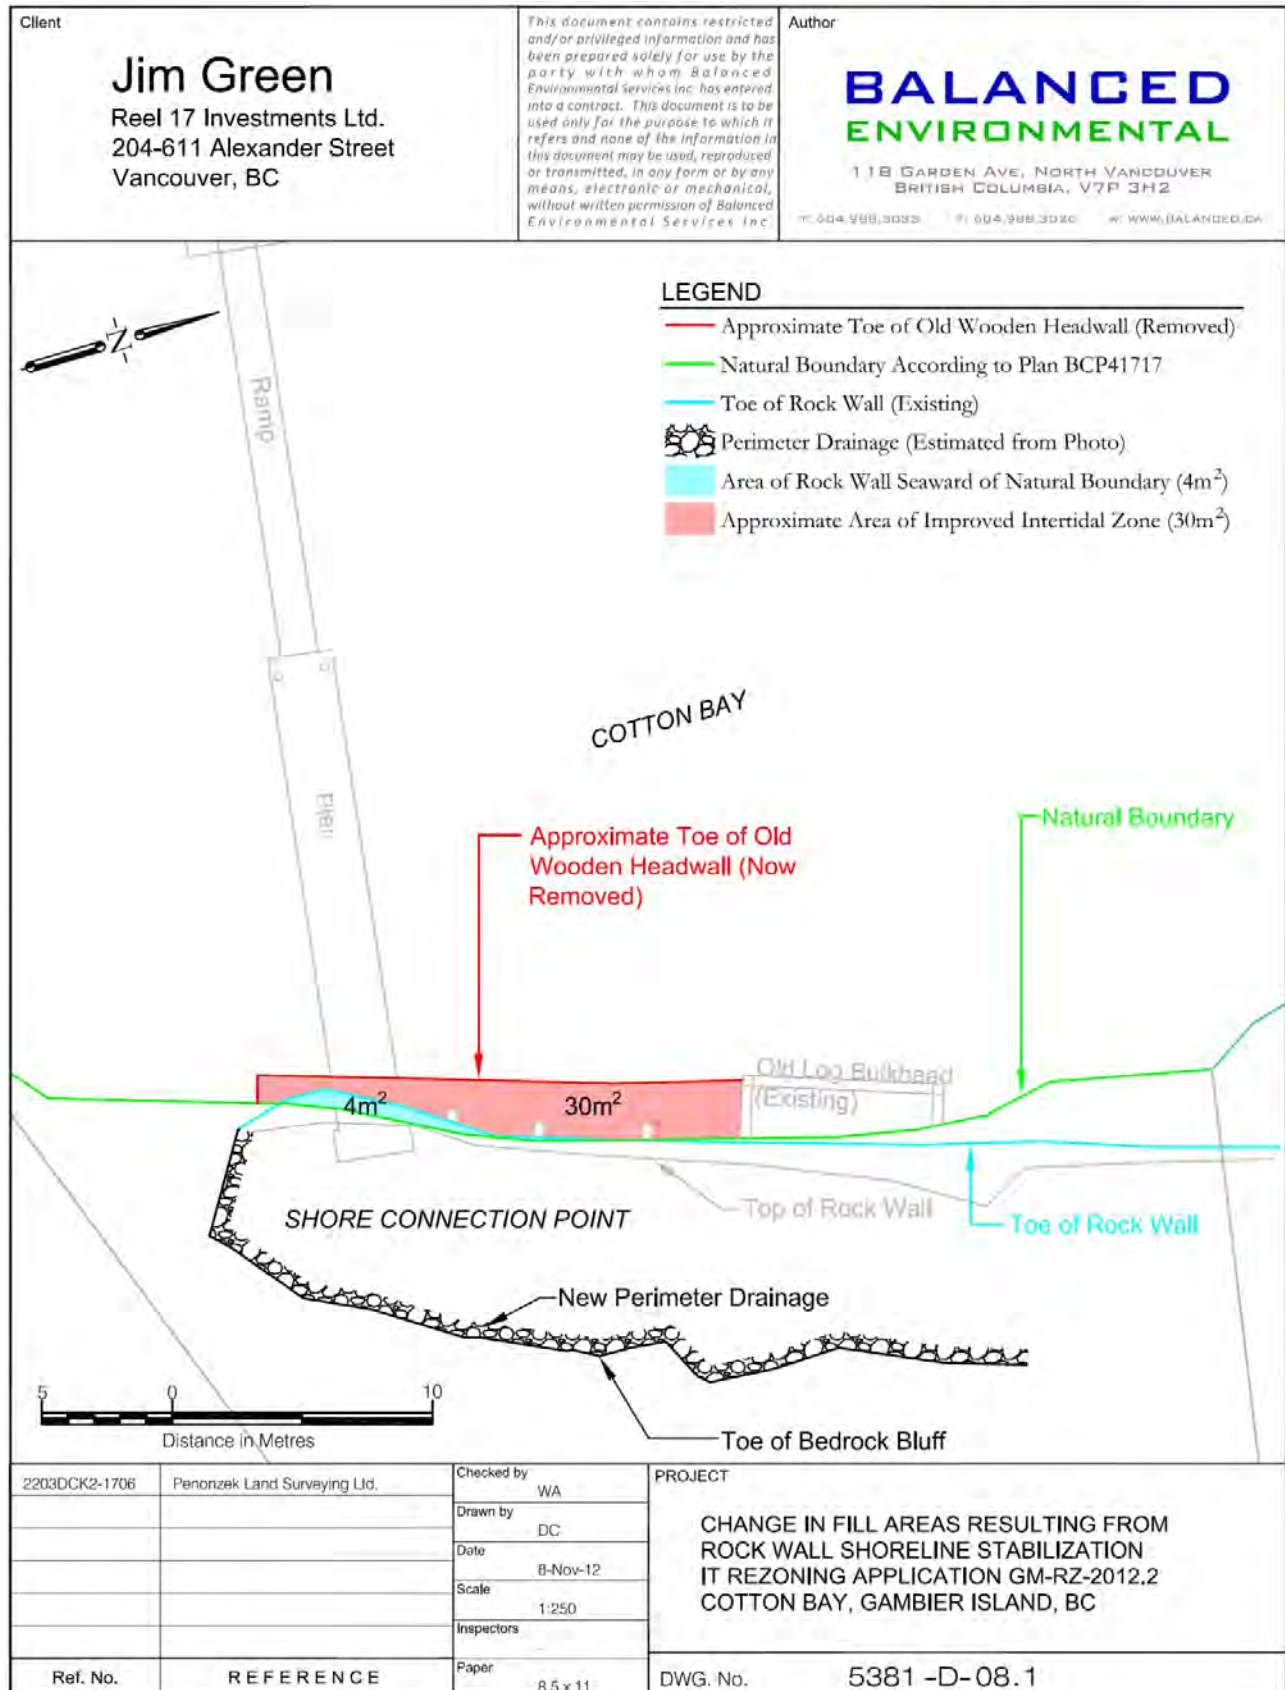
Drawing showing estimated recovery of intertidal seabed between the current rock wall and the previously existing timber headwall. The survey of the remaining sections of timber headwall, the rock wall, and the toe of the bedrock bluff was performed by Penonzek Surveying in 2012.
